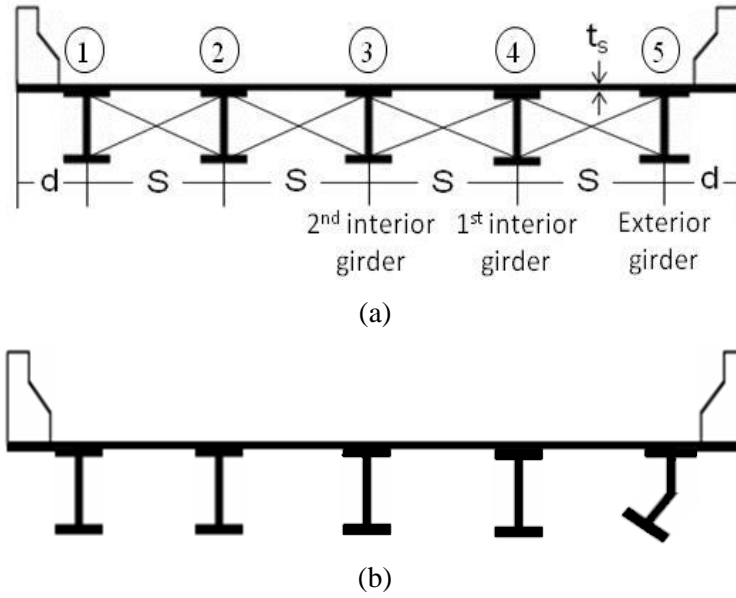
Girder layout (a) before damage (b) after damage
